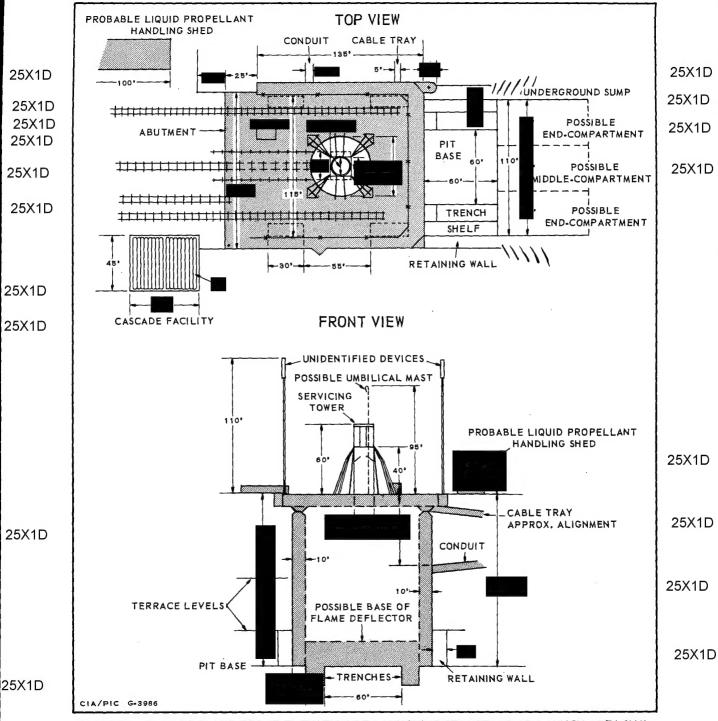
PLAN VIEW AND FRONT ELEVATION OF LAUNCHING STRUCTURE AT LAUNCH AREA "A".
